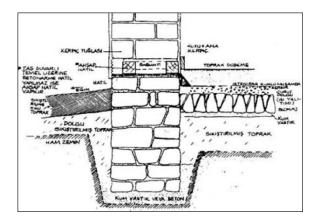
Reinforced concrete beams at the top of the stone foundation wall, and correction [39]
